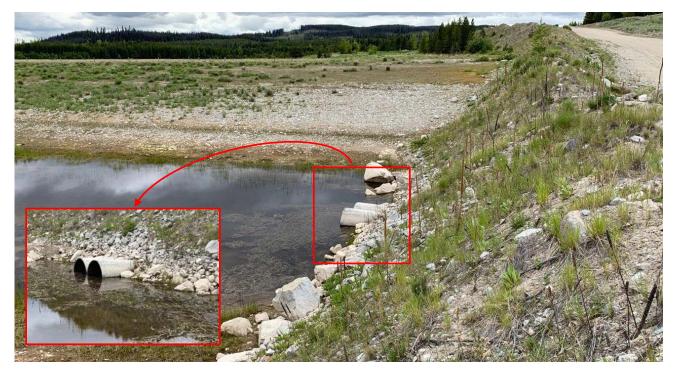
Highmont Spillway approach channel, concrete lock-block control sill – Spillway is inactive. Water ponded downstream of sill is controlled by level at spillway flow control gate (HGH-2019-14)
